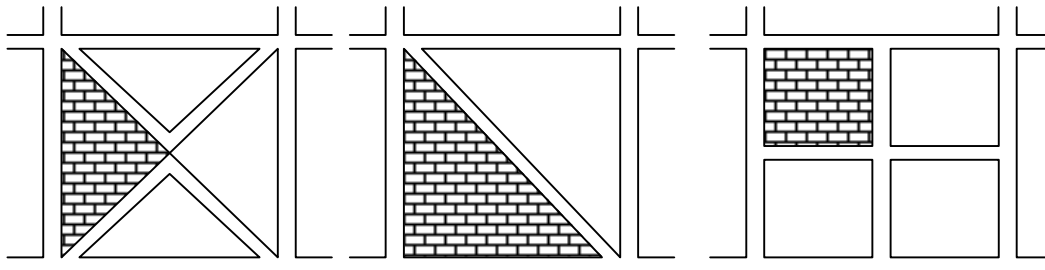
Bracing of frame bays infilled with unreinforced masonry
